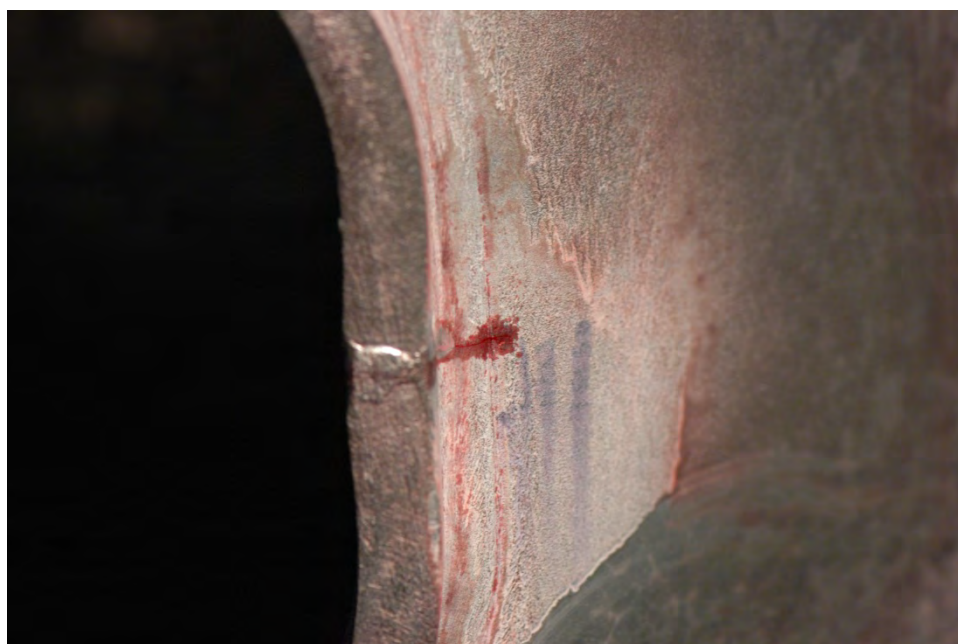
Fatigue cracking from seam weld in the hand hole frame of specimen VII-4
